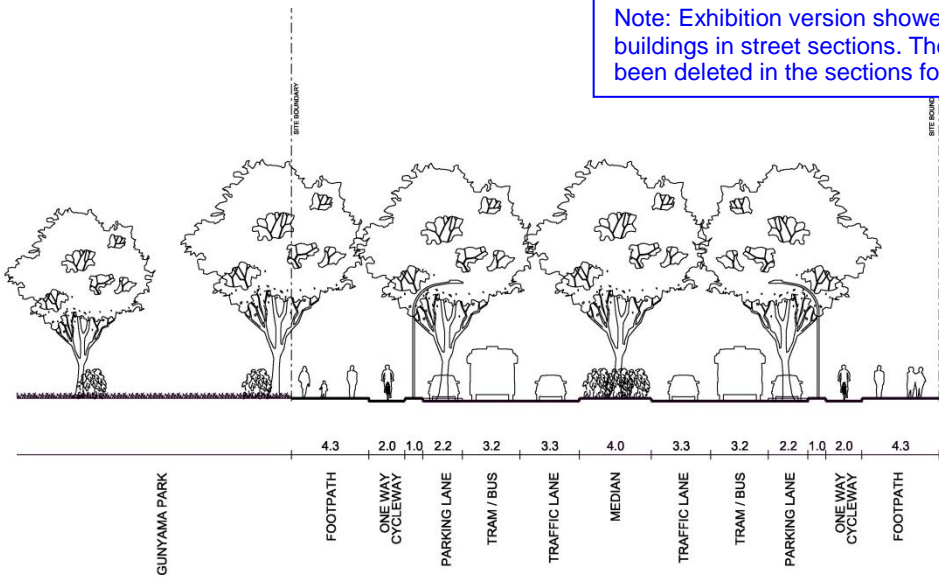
Epsom Park - Zetland Avenue (36m) Section A1
